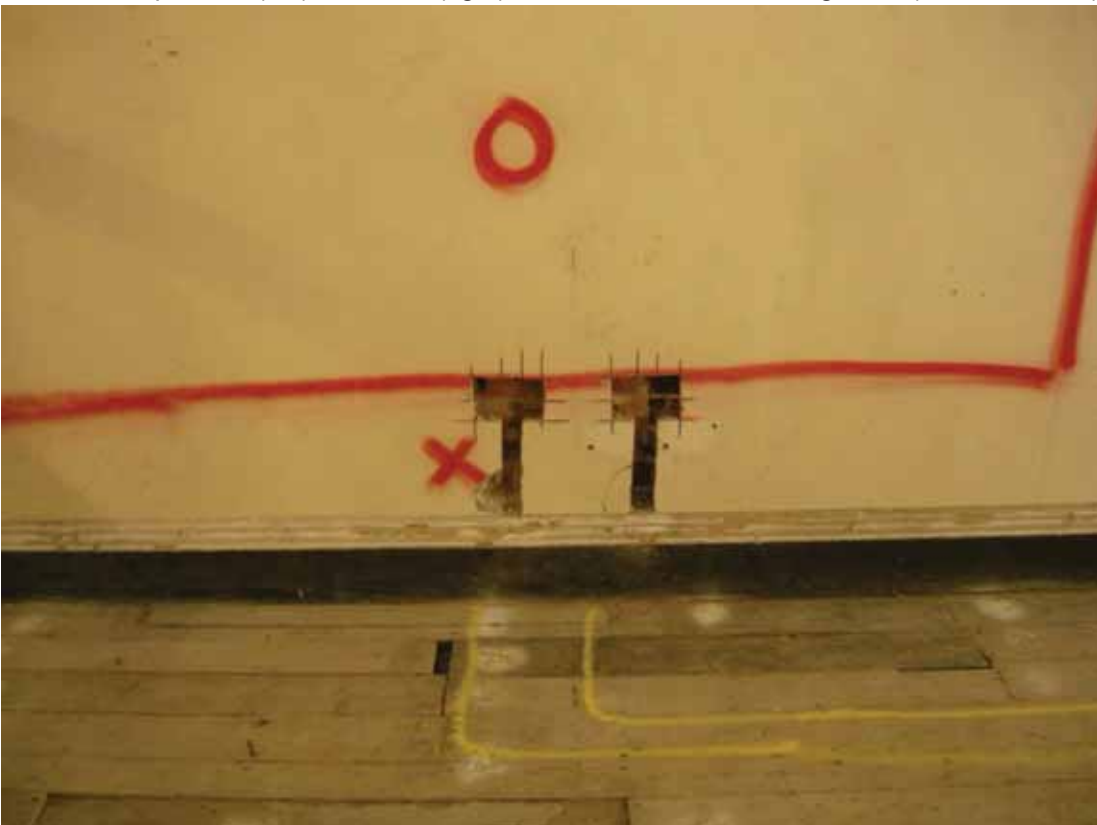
North wall in Room S16, looking north (EAF10 BHD8 (40))
